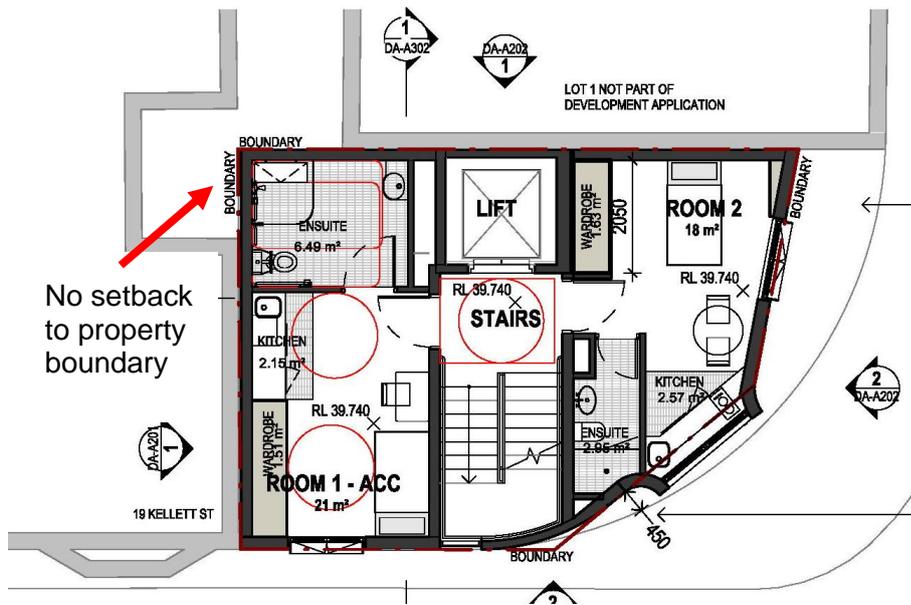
Original level 1 floor plan built to the boundary of the internal light well
